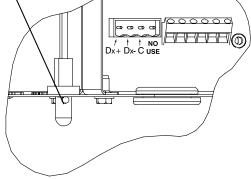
Outdoor Air Thermistor (OAT) Attachment
